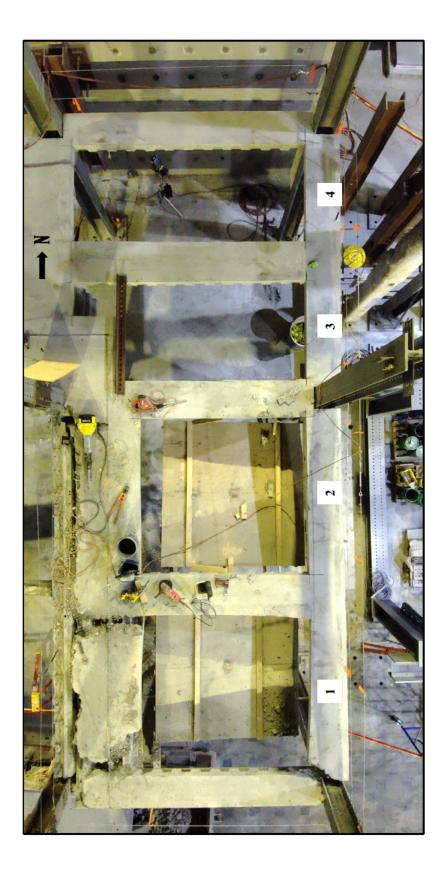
Aerial view showing the four cut bays in the surrounding floor.
